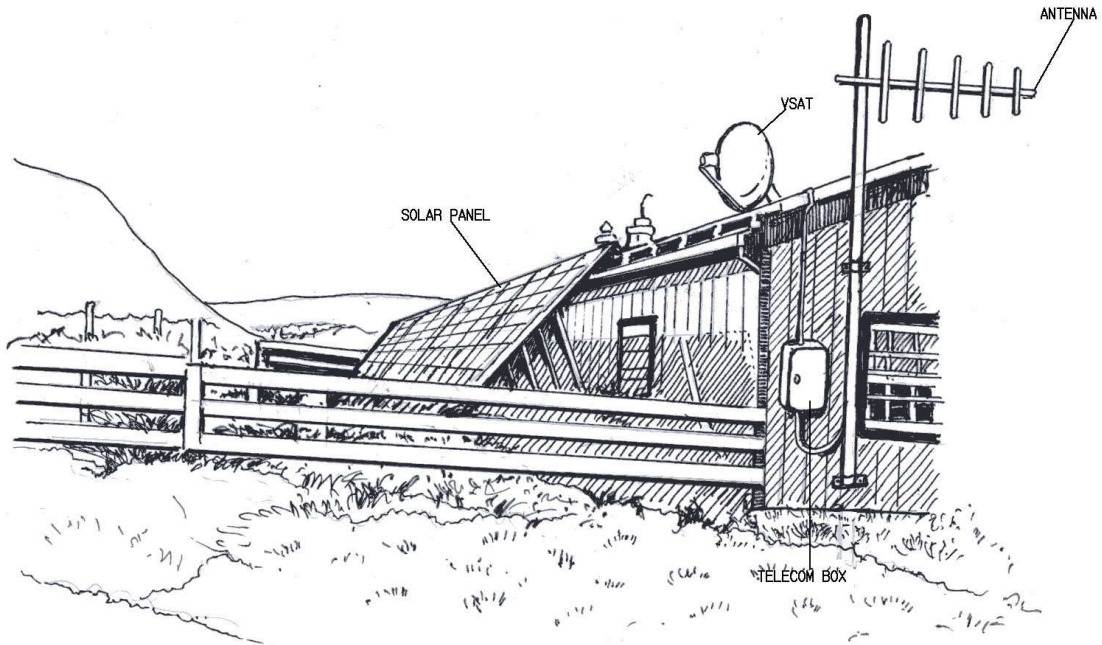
POWER STATION (35KW), POTENTIAL CELL SITE BEHIND BUILDING
